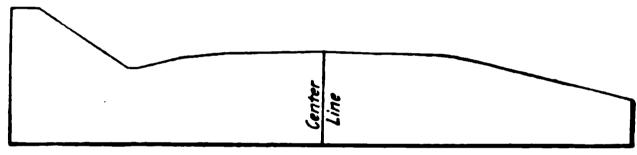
Transparent Templet for Use on Cross-Sections Giving Finished Shape of Road
